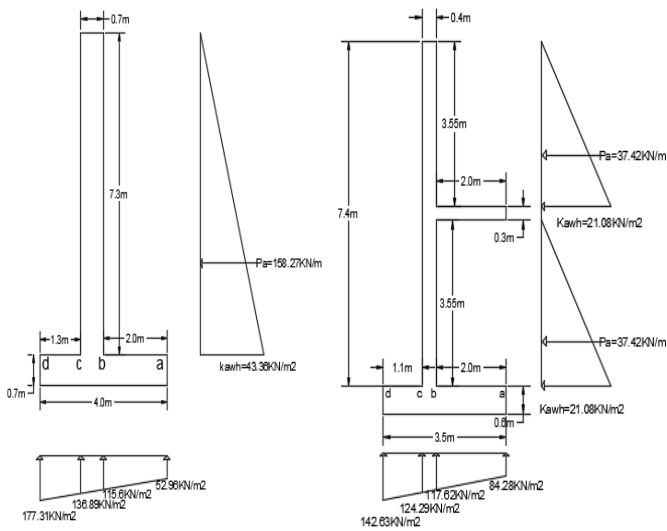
Lateral Earth Pressure Diagram of 8m retaining wall
